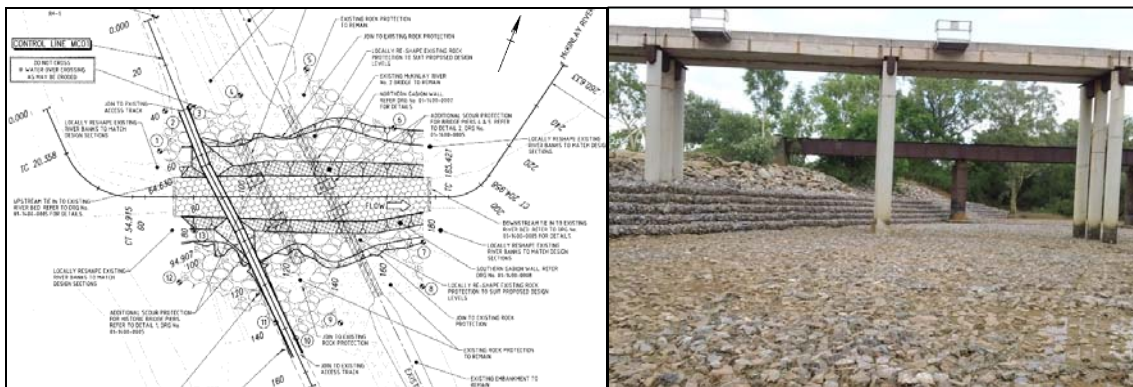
Scour Protection Design and Completed Scour Protection Work
